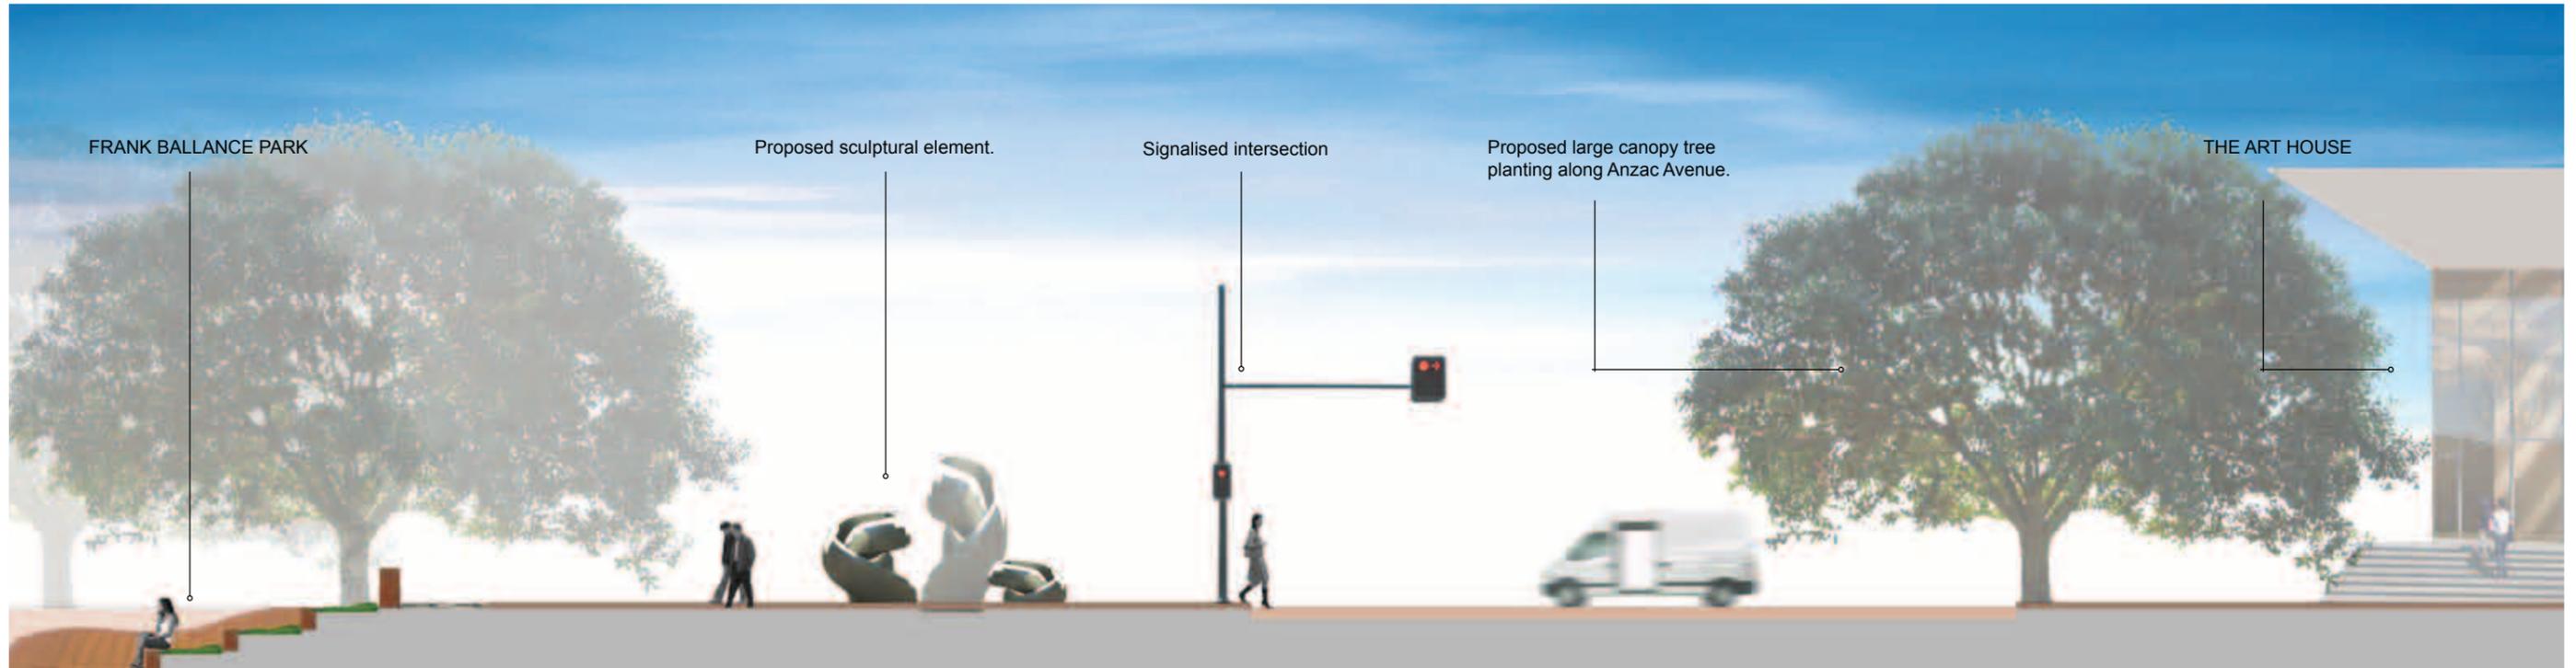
PROPOSED INTERSECTION UPGRADE MARGARET STREET AND ANZAC AVENUE CONCEPT PLAN
